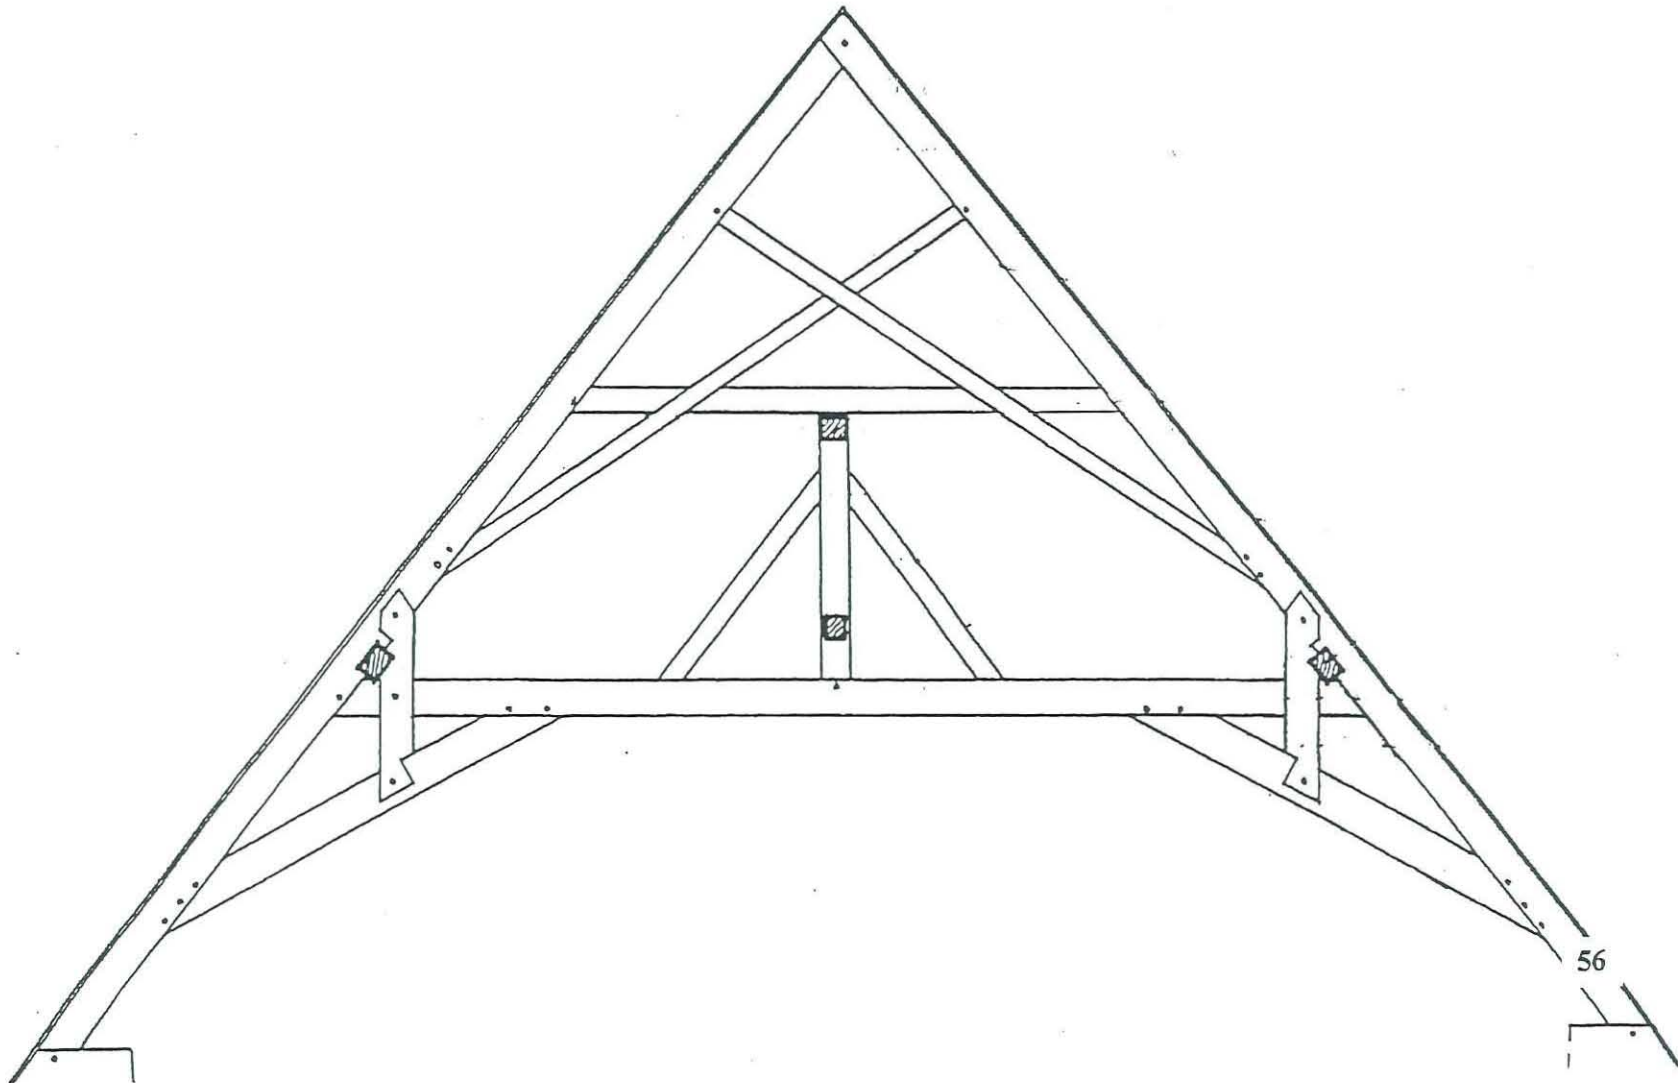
Drawing of frame 53 of the Choir and crossing, viewed from the east, to show sample locations
